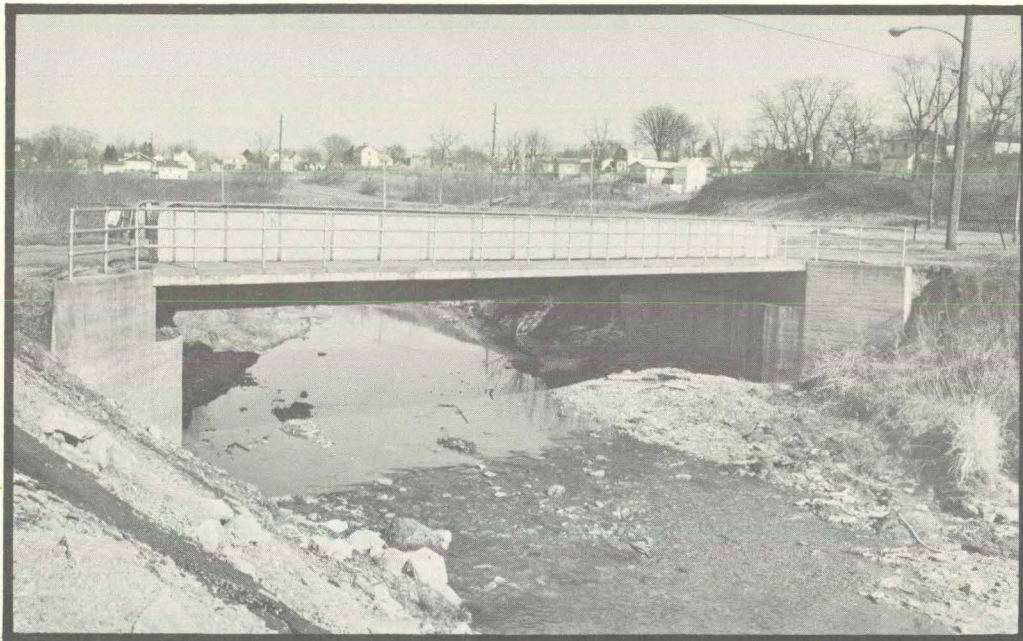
Looking upstream at Ninth Street bridge over Mad Creek at Muscatine, Iowa, Sta. 46+50.
